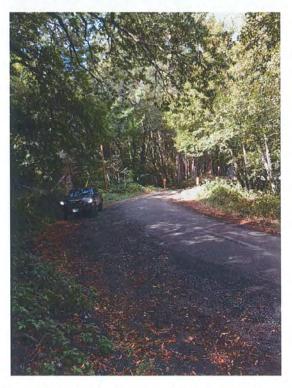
RP 4. Turnout after Single-Lane Bridge (bridge pictured in foreground). Vehicle traveling east (parked in large turnout east of bridge), photo taken facing west.
